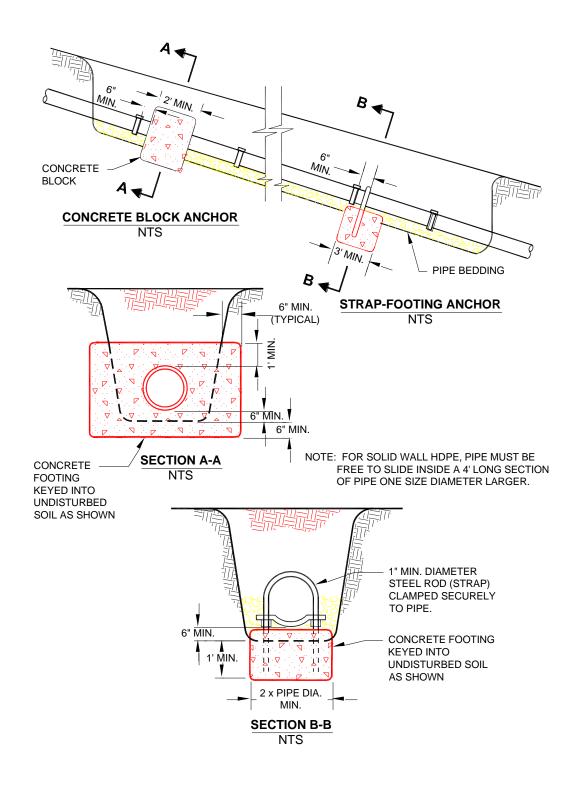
C CORRUGATED METAL PIPE COUPLING AND/OR GENERAL PIPE ANCHOR ASSEMBLY
